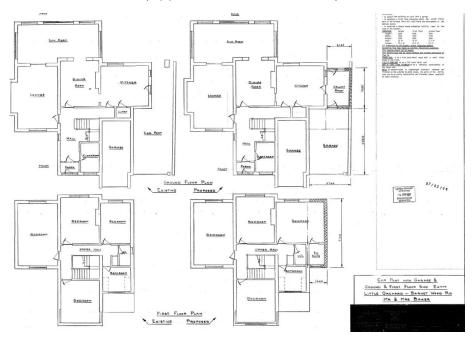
Floorplans of previously Approved (unimplemented) application (App Ref: 07/02106/FULL6)
